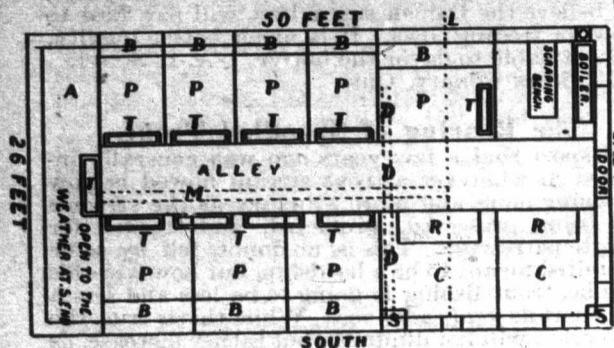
GROUND FLOOR PLAN OF F. J. COLLYER'S PIGGERY AND HENNERY.
